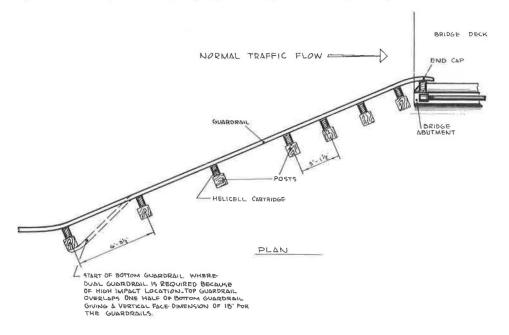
Guardrail protection at bridge approach using helicell cartridge backup.
